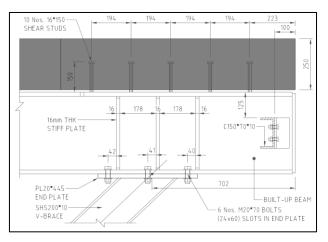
Strut & Bracket (Section) (dimensions in mm)
